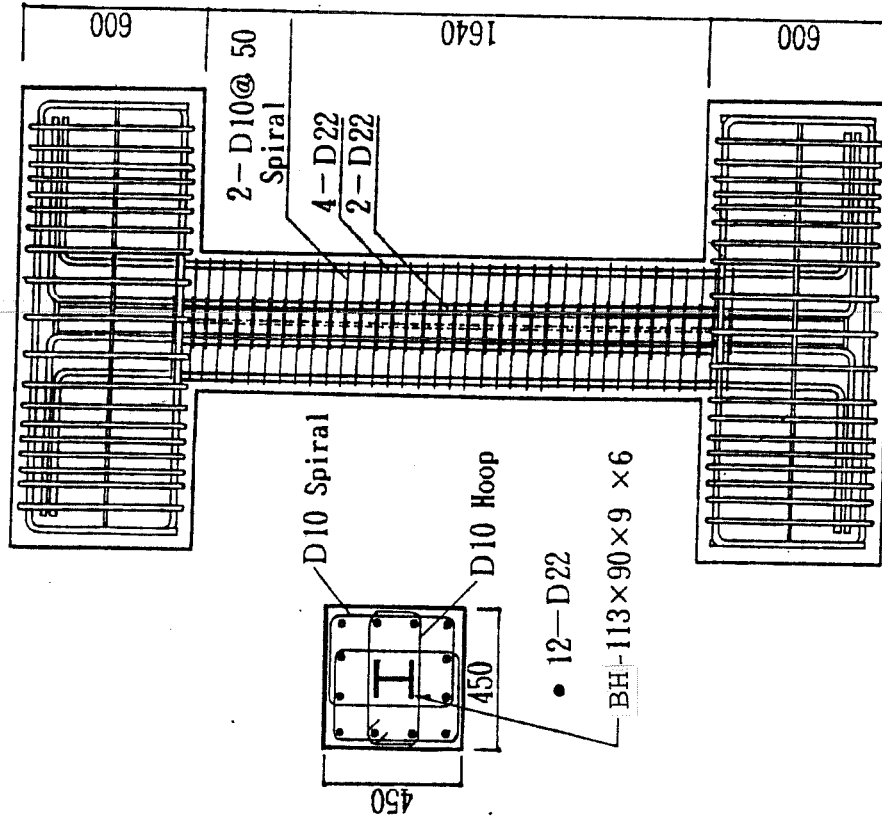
Details of Exterior Column Specimen (1G-OUT)
